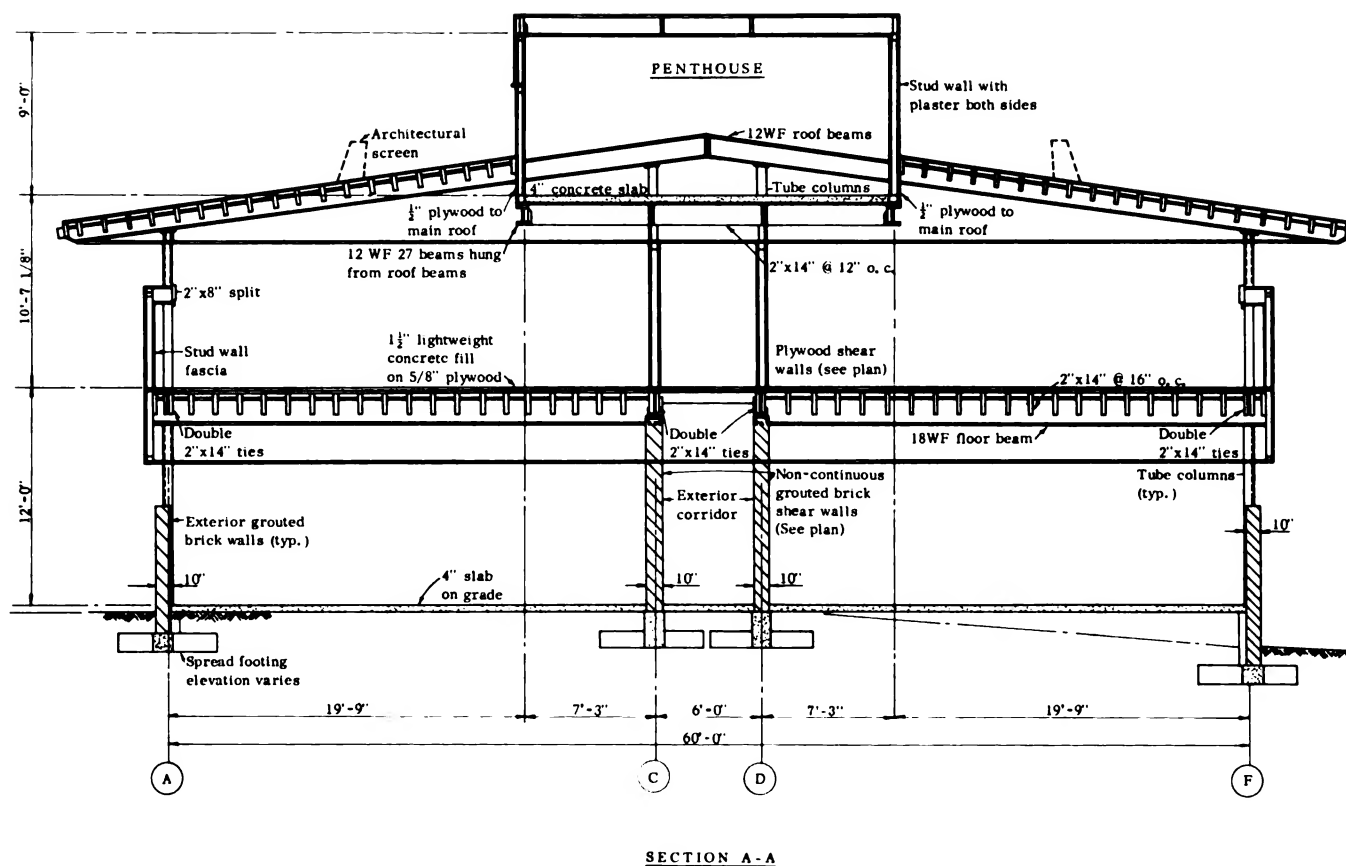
Pacoima Lutheran Medical Center. Section and details.
